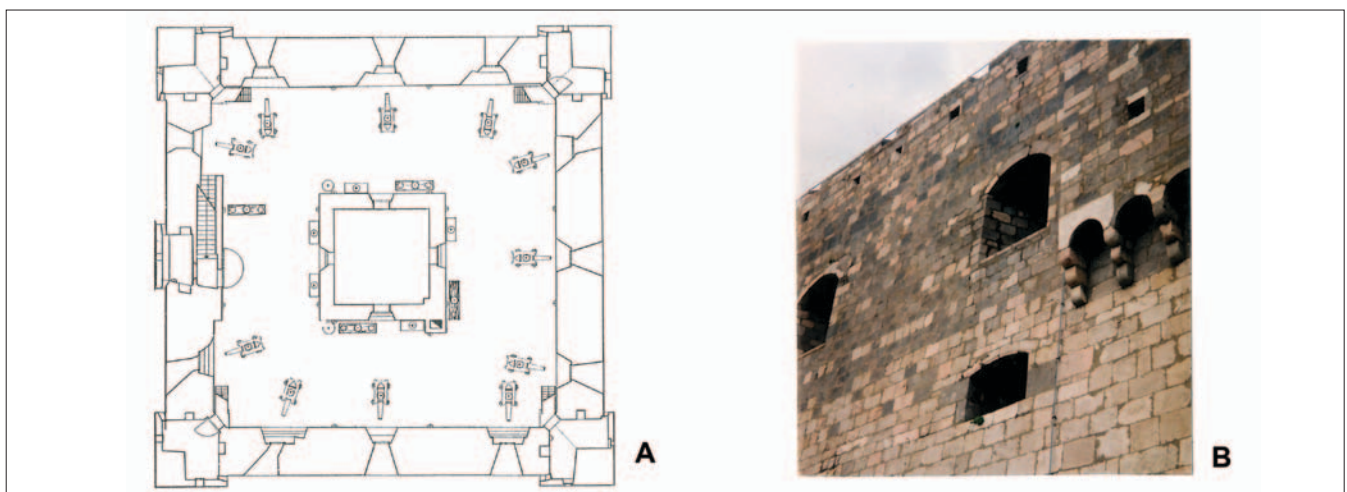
Nehaj castle above Senj: A – layout of the 2nd floor (attic), with an assumed arrangement of cannons and openings for their usage (Viličić 1971: Fig. 61); B – part of the facade with cannon openings on 1st and 2nd floor (photo by: Z. Horvat)
